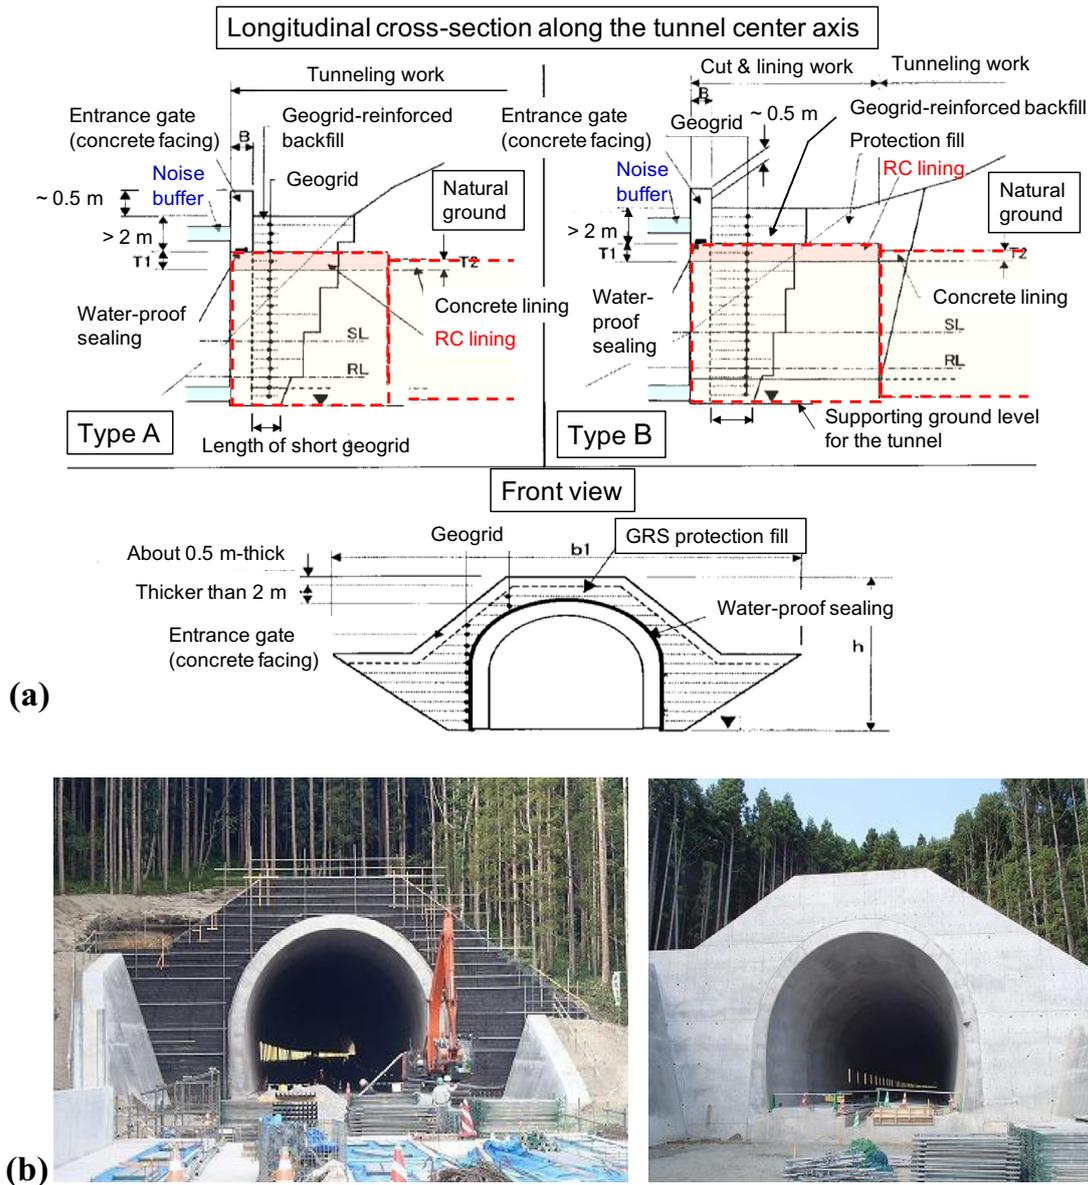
GRS Tunnel Entrance Protection: (a) two types: and (b) before and after the construction of the front facing at site T10 (at the entrance of Mantaro tunnel).
